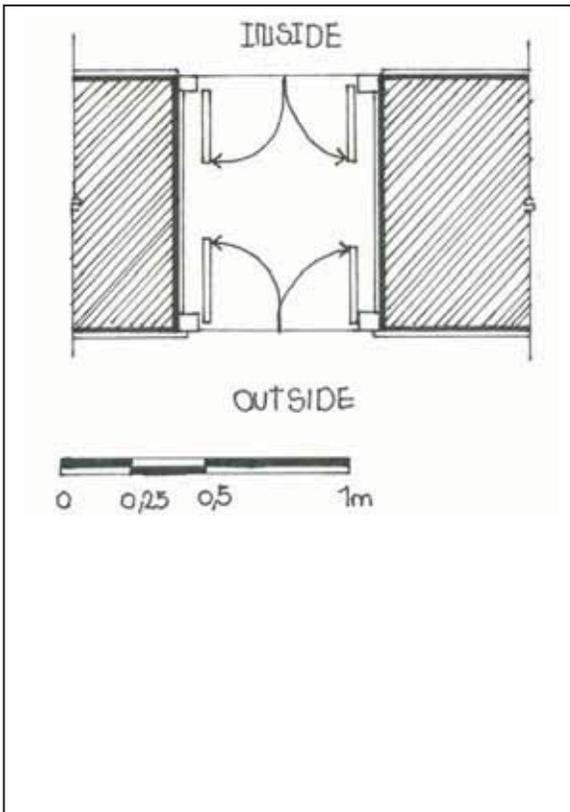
Plan of the wooden window of the summer room. Drawing by author, 2008.
